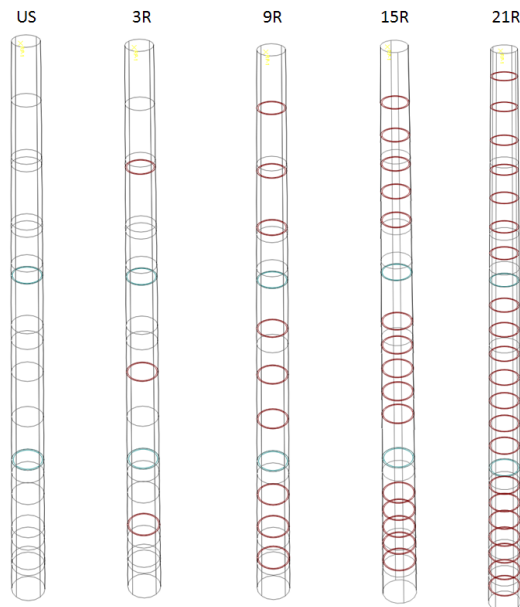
Structural models analyzed, including unstiffened tower and four different stiffening schemes
